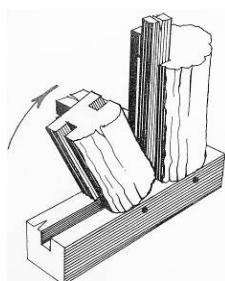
Greenstead, (England - Essex), a church with wc fragments from 845 - joints of wall beams with a beam of foundations and a crowning beam [6]
